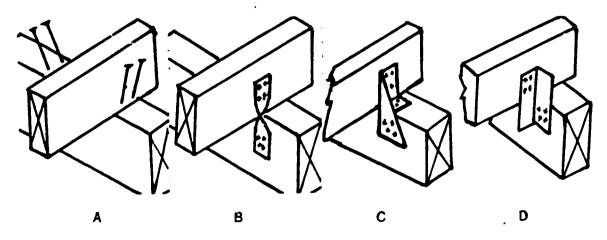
shows different fastening of floor joists to bearers. A: Skew nailing; B: Hoop metal strap; C and D: Angle shaped metal connectors
